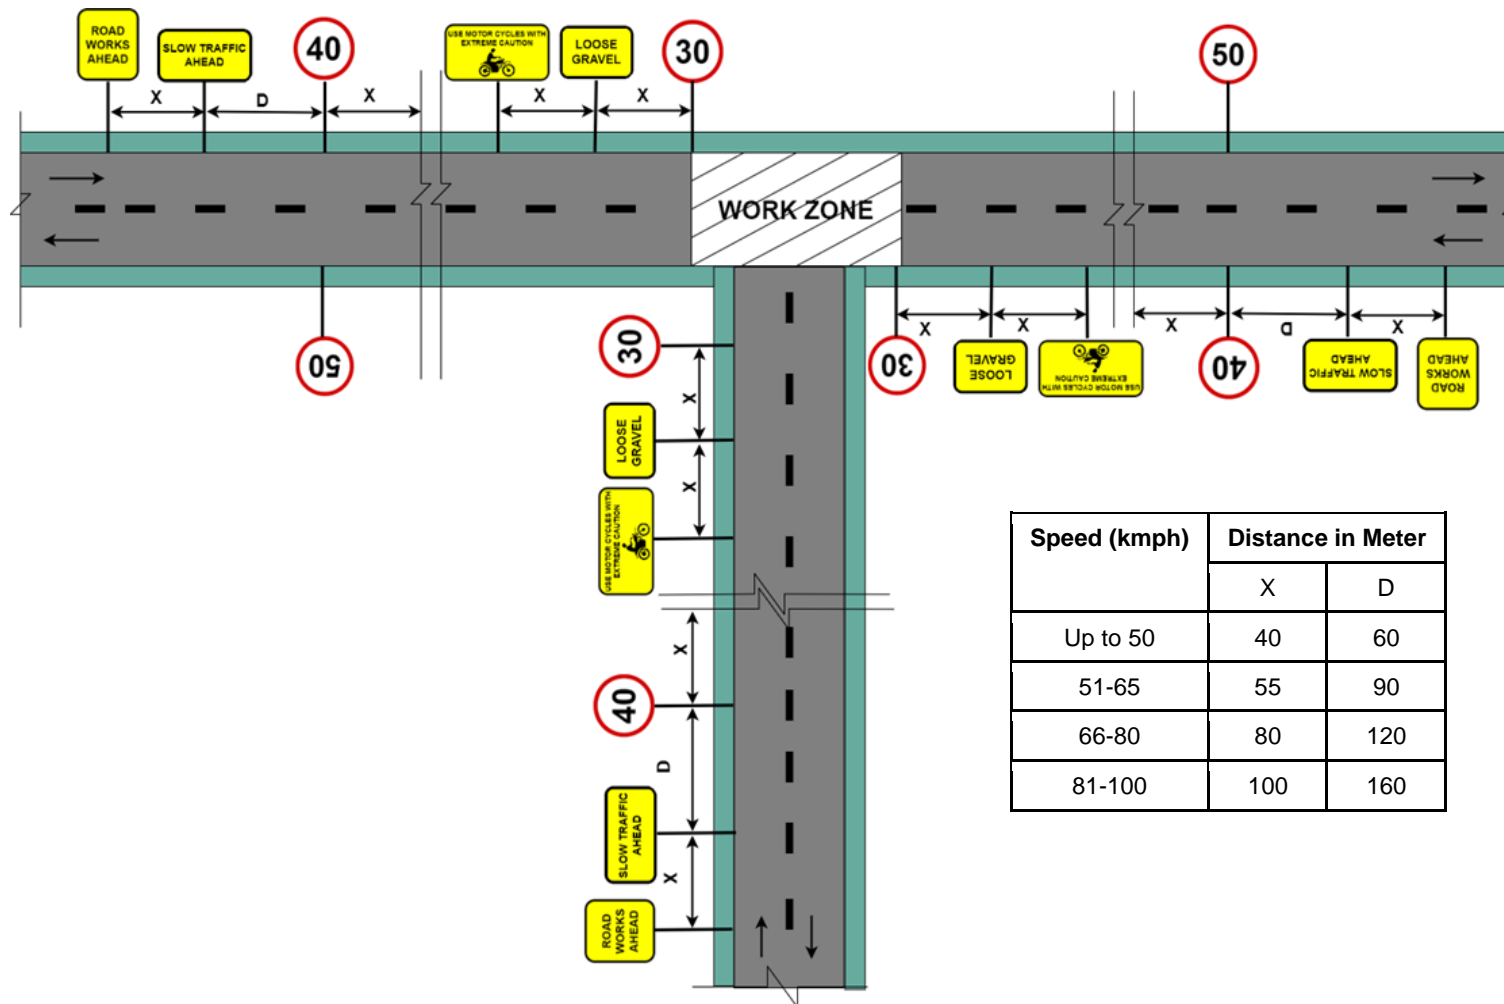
Roadwork on the Central Area of T-Intersection
